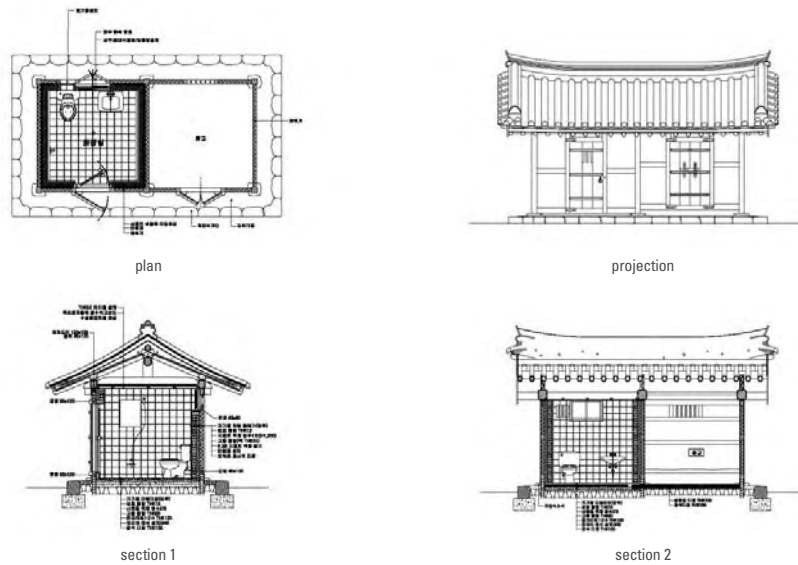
Design Guidelines for Modification of Layout and Structure (new construction of bathroom as a tile roofed annex)
